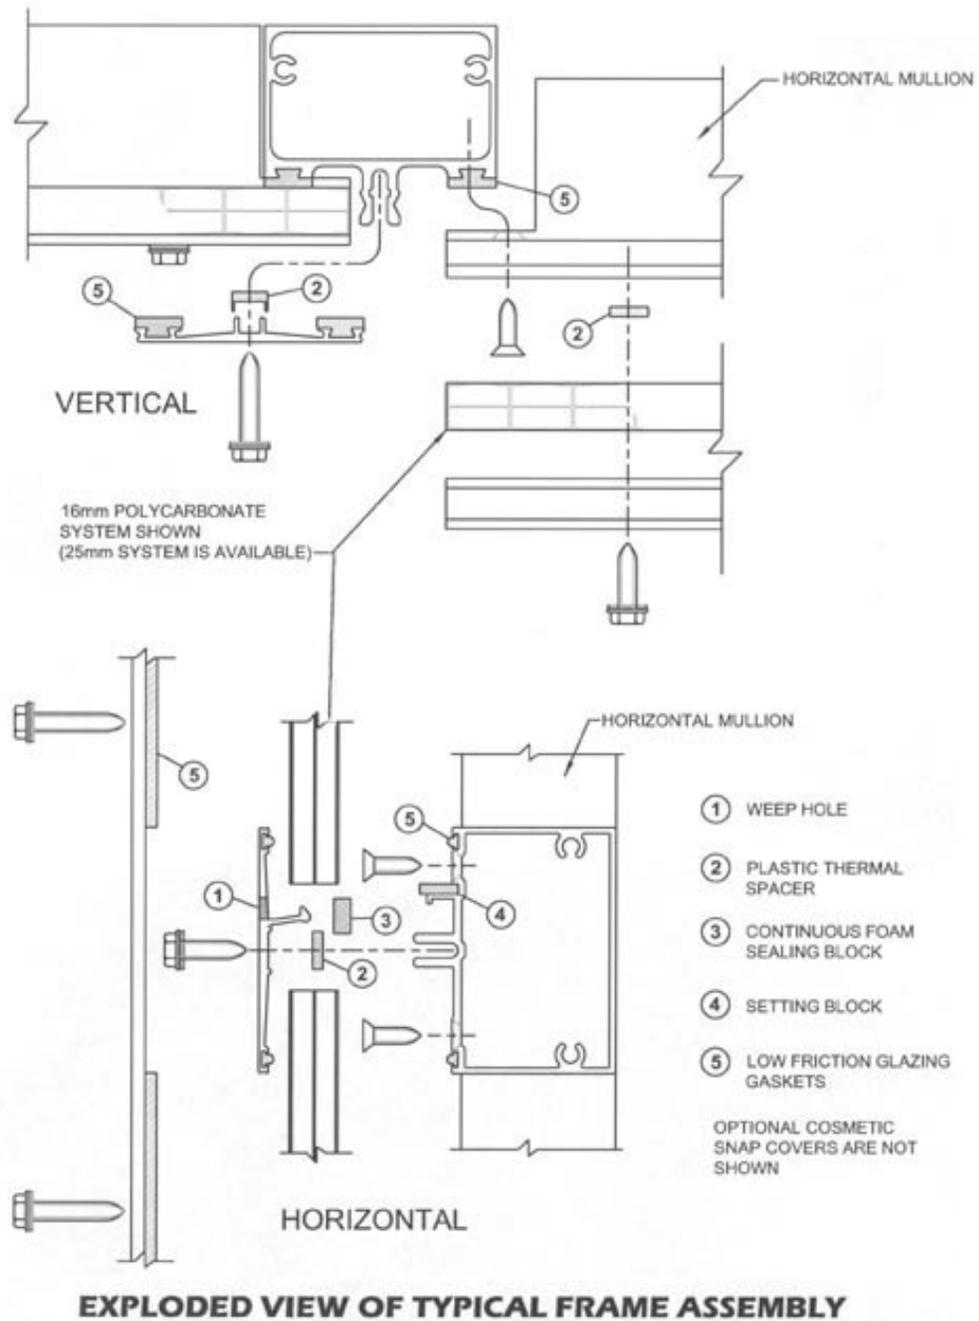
Exploded view of typical frame assembly (Extech [online]. (n.d.). from. <http://www.extech-voegele.com/3000spec.htm7.jpg> [Accessed at December 2006.]
